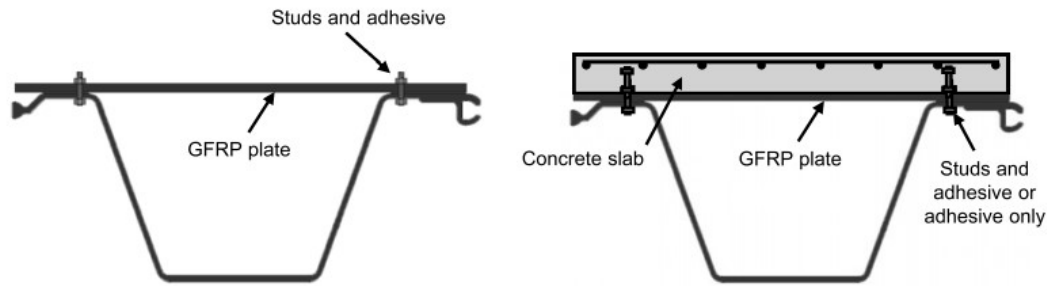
Hybrid FRP-concrete girders analysed (Fam and Honickman 2010).
